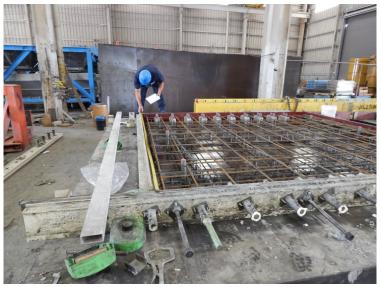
Photo. Formwork being checked for tolerances.
